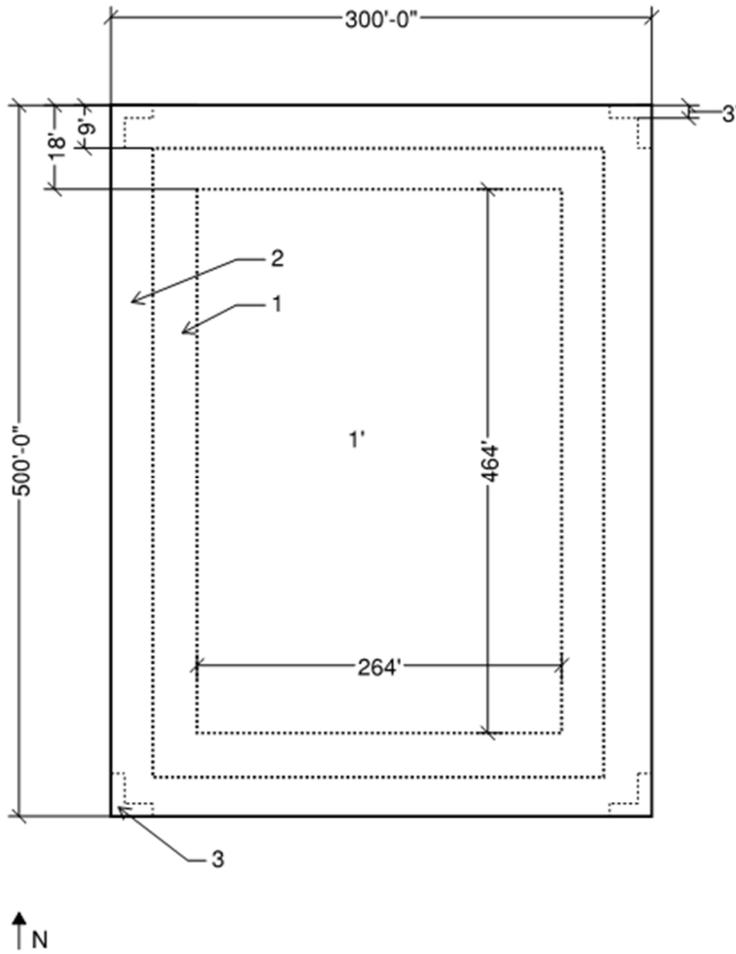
Plan view of the elementary school with the C&C zones (NTS)
